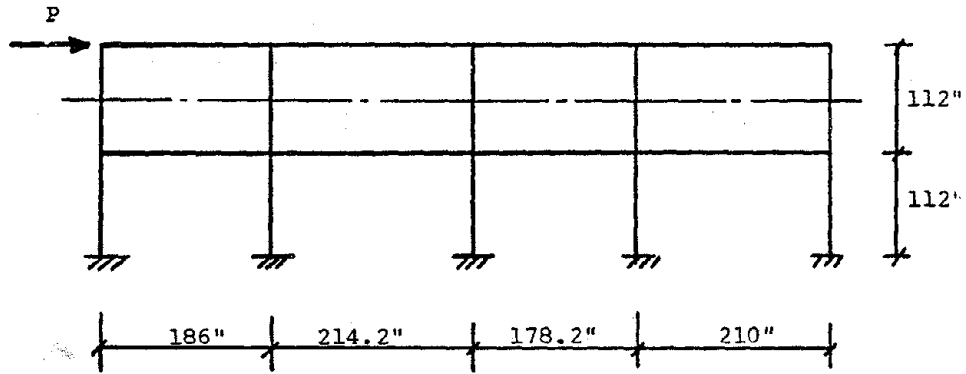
BEAM AND COLUMN SUB-STRUCTURE
